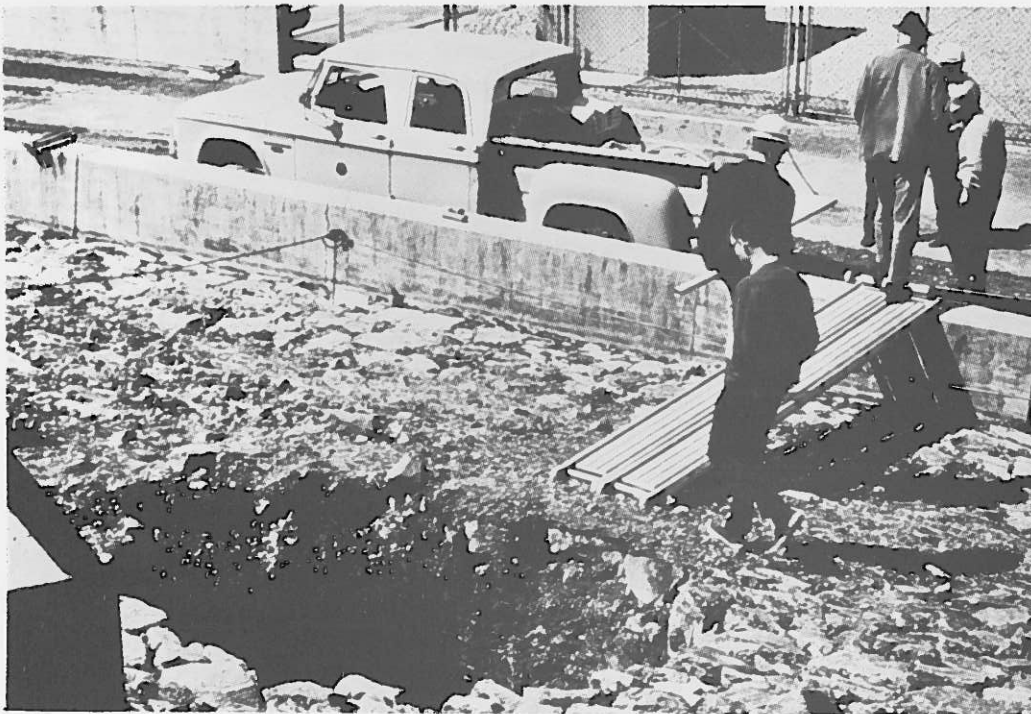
FIRST SINKHOLE AT TOE OF EMBANKMENT.
